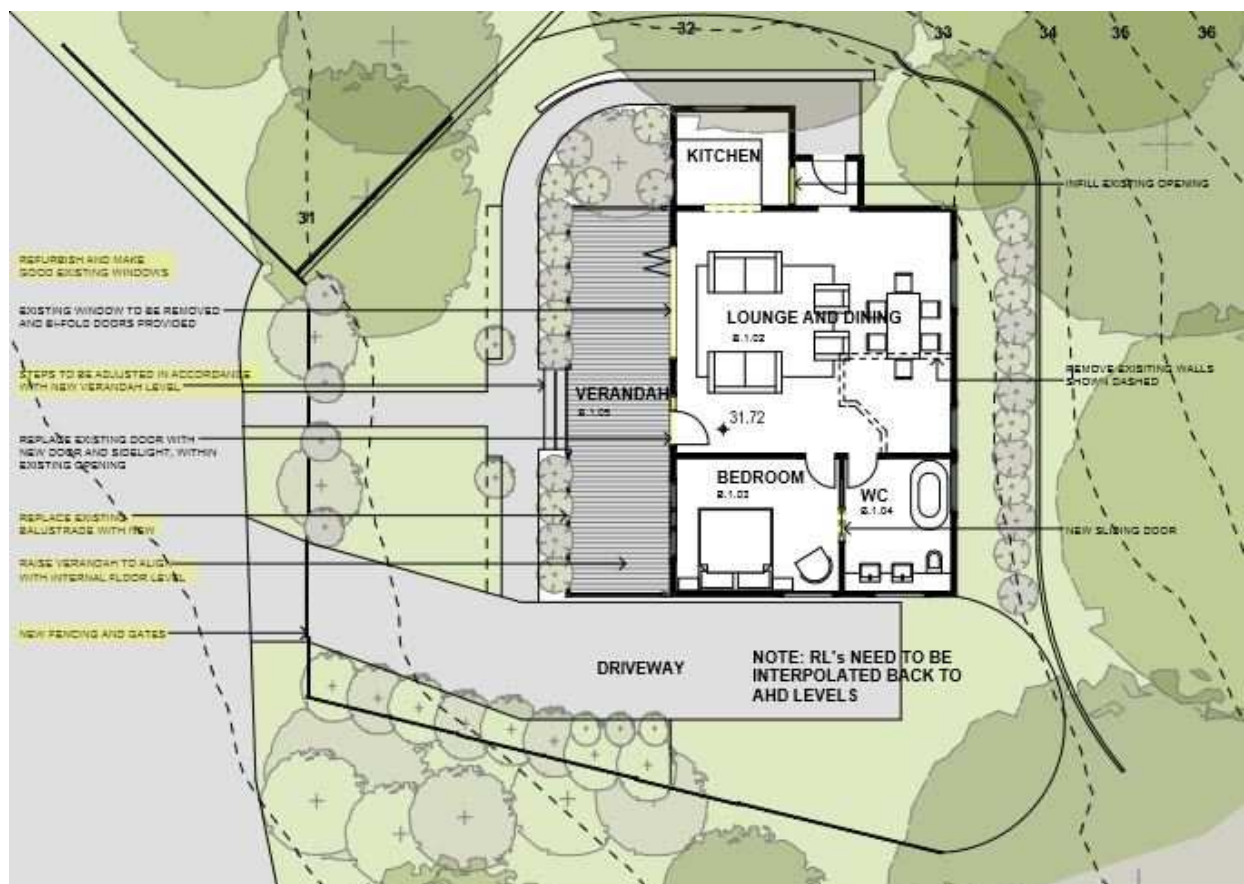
Gap Bluff Cottage Proposed Floor Plan
